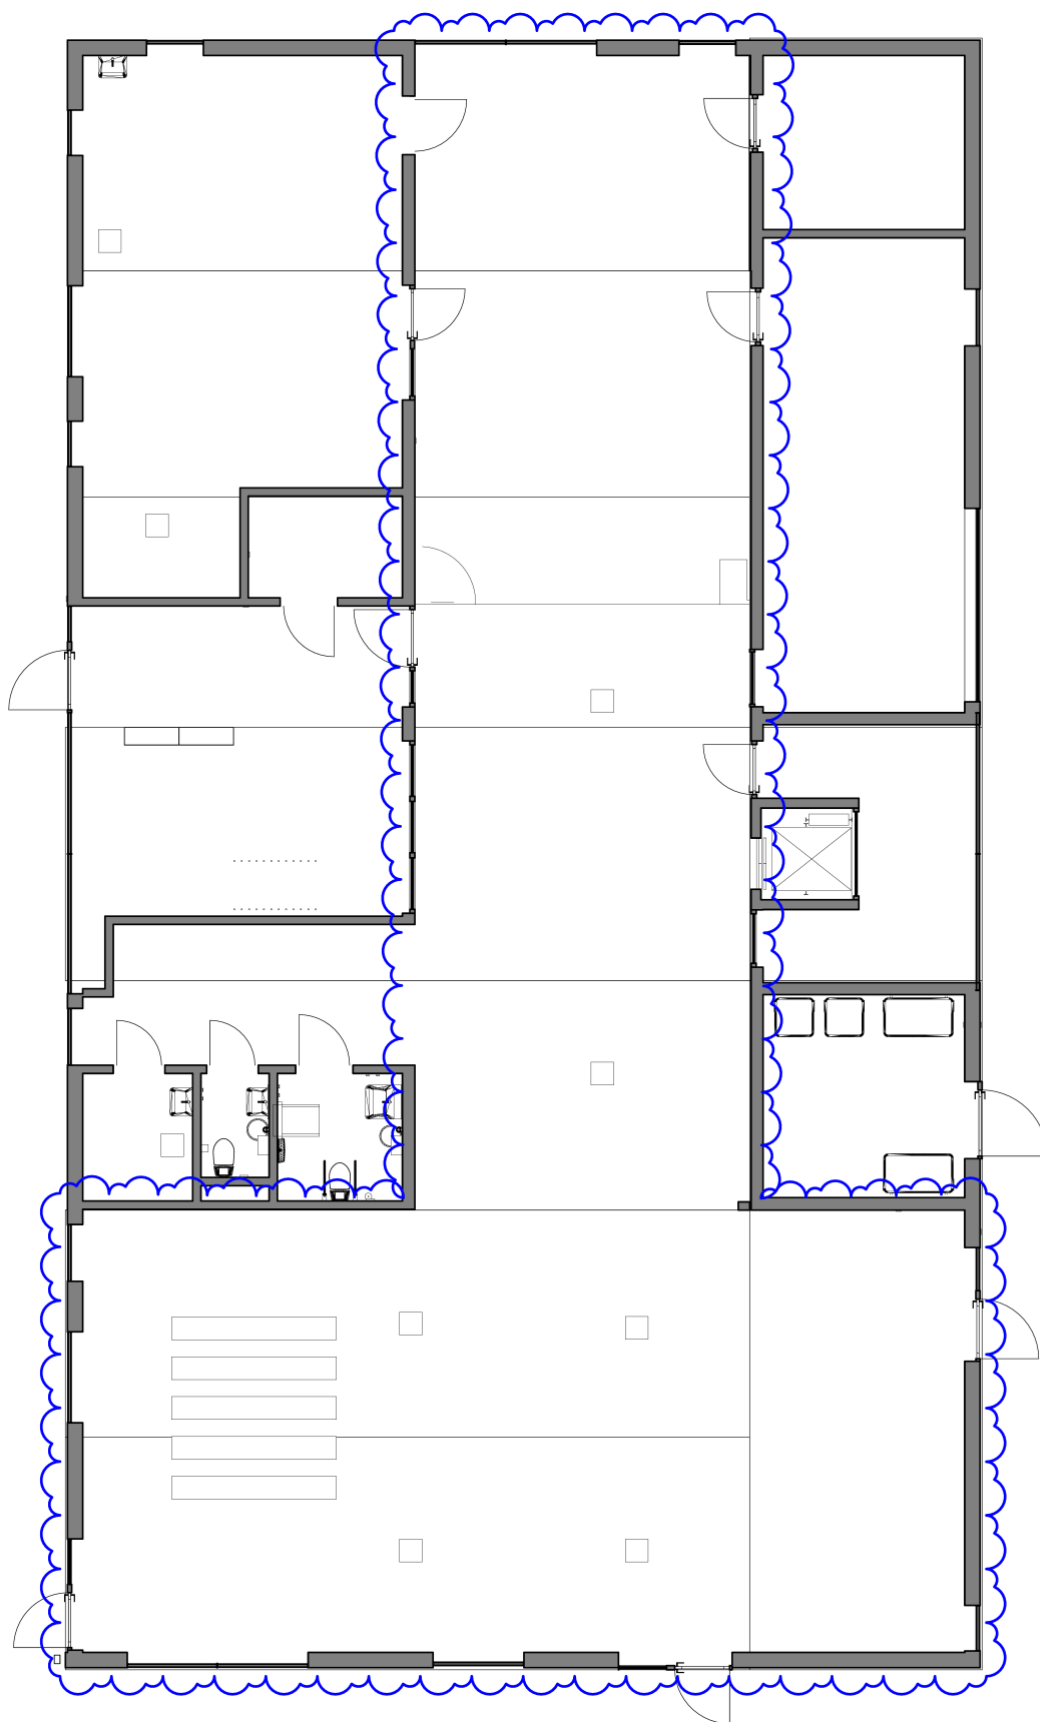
Existing Layout of Ground Floor HSB Living Lab
